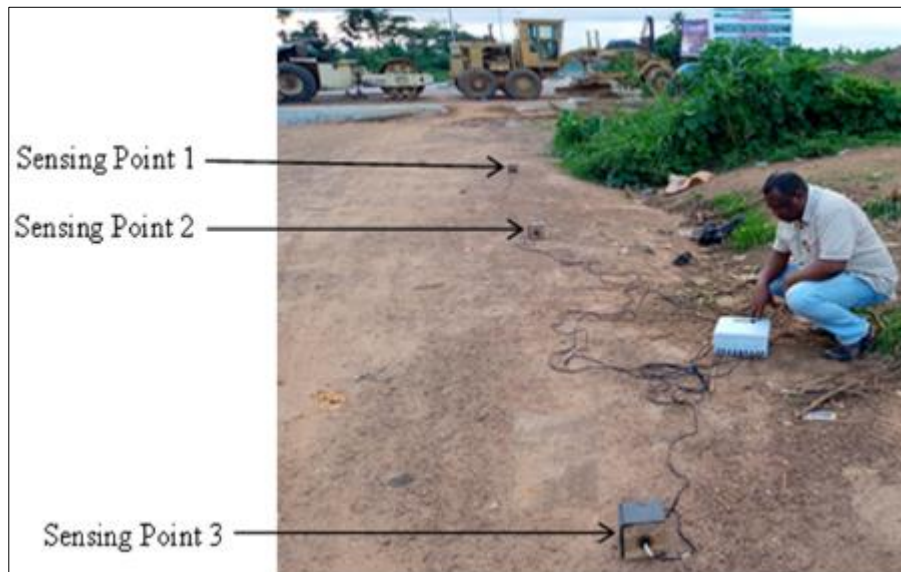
Experimental Setup at Road Construction Site in Oba-Ile, Akure, Ondo State, Nigeria
